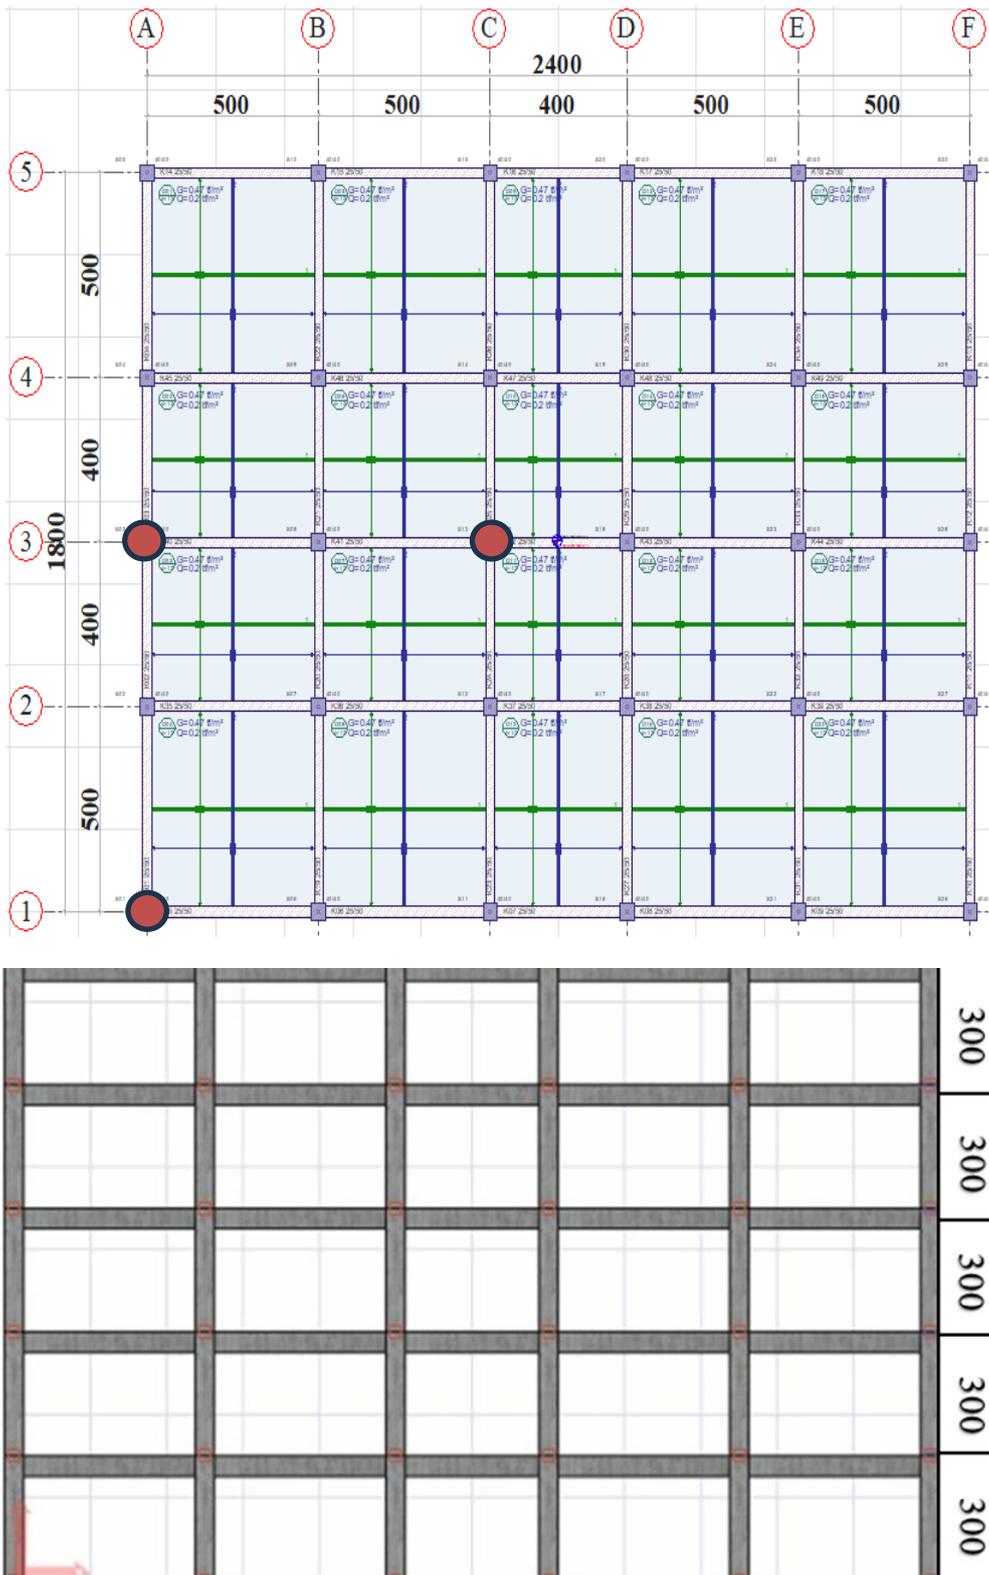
Building Plan (top) and elevation (bottom) views of the buildings (dimensions in cm)
